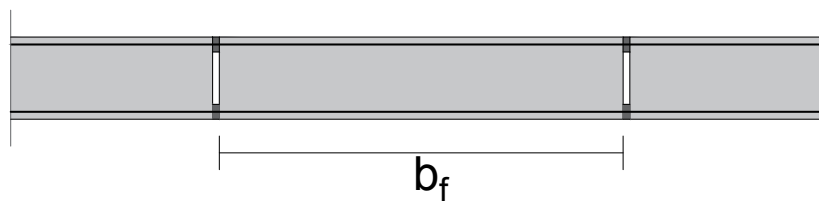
Transverse floor-to-floor connection by double prestressing at both the top and the bottom of the cross-section
